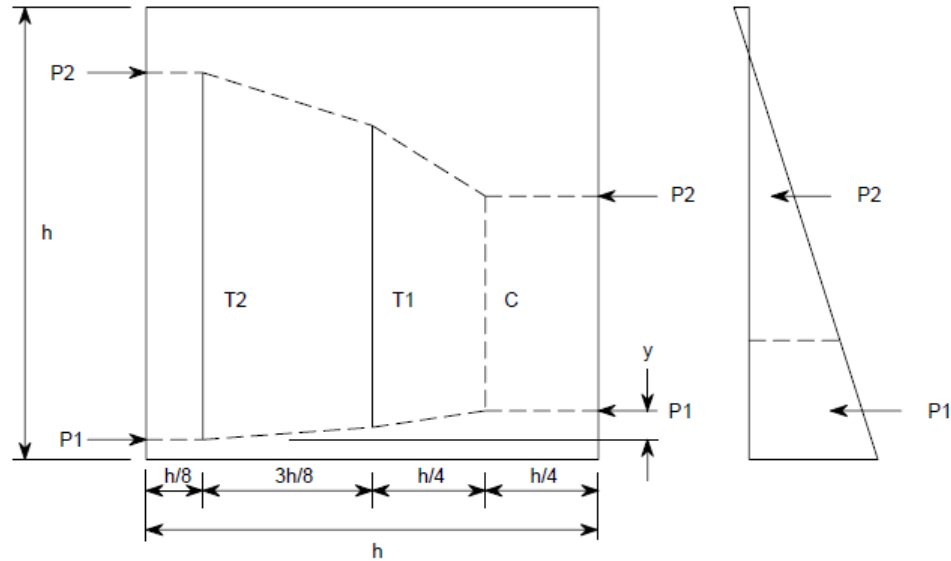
A sample double-tie, strut-and-tie model for end anchorage design of pretensioned concrete members. Adapted from (Crispino, Cousins, & Roberts-Wollmann, Anchorage Zone Design for Pretensioned Precast Bulb-T Bridge Girders in Virginia, 2009).
